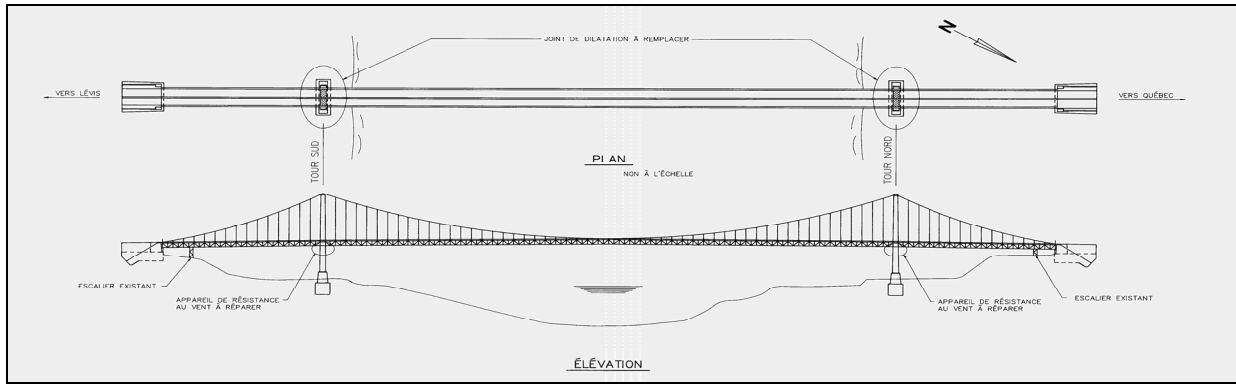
Plan layout and side elevation of Pierre-Laporte Suspension Bridge (Ministère des Transports du Québec)
